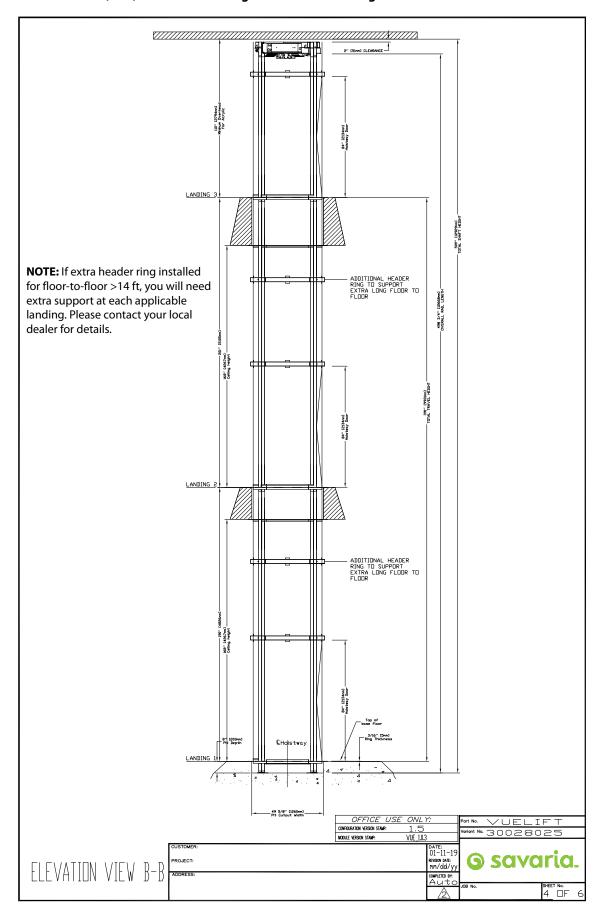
Elevation view (RGL) - extra header rings if floor-to-floor height > 14 ft
